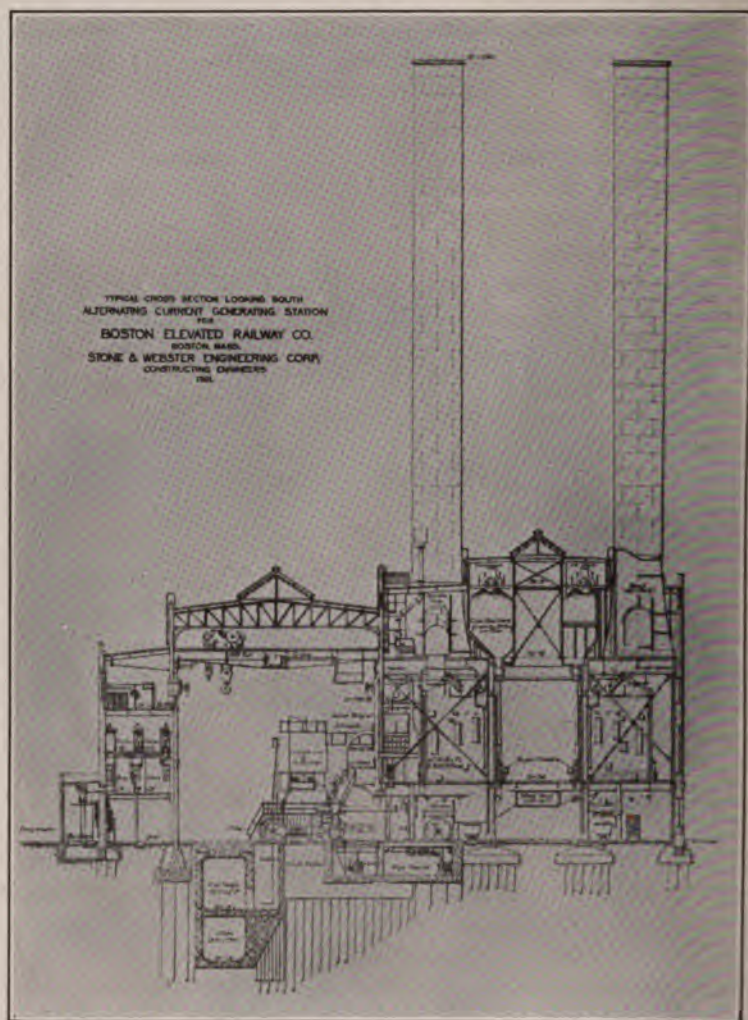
Cross-section Boston Elevated, Including Stacks.
